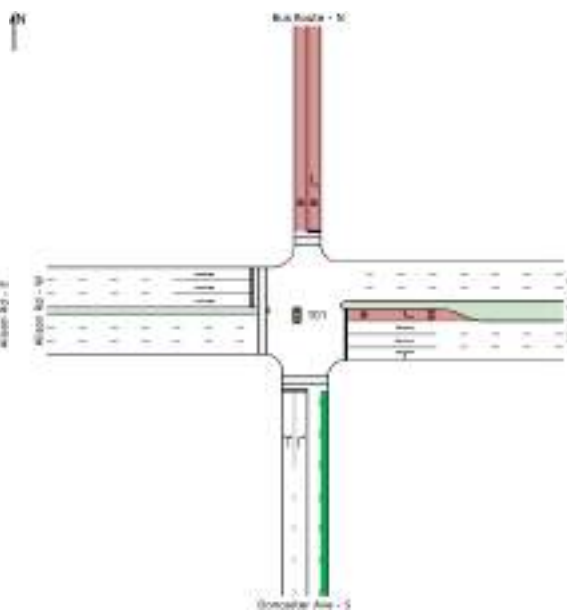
Existing Doncaster Avenue/ Todman Avenue layout
